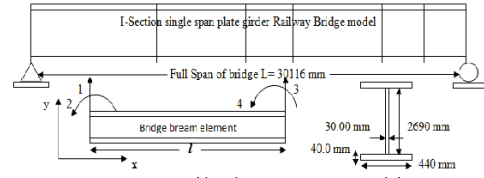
Span of bridge, X-section and finite beam element of bridge
